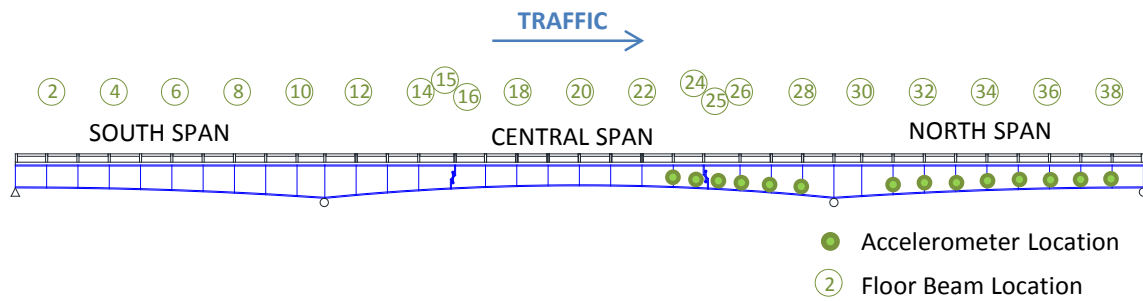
Elevation view of the west longitudinal girder at the Medina River Bridge from the inside showing accelerometer locations (brace sensors not shown).
